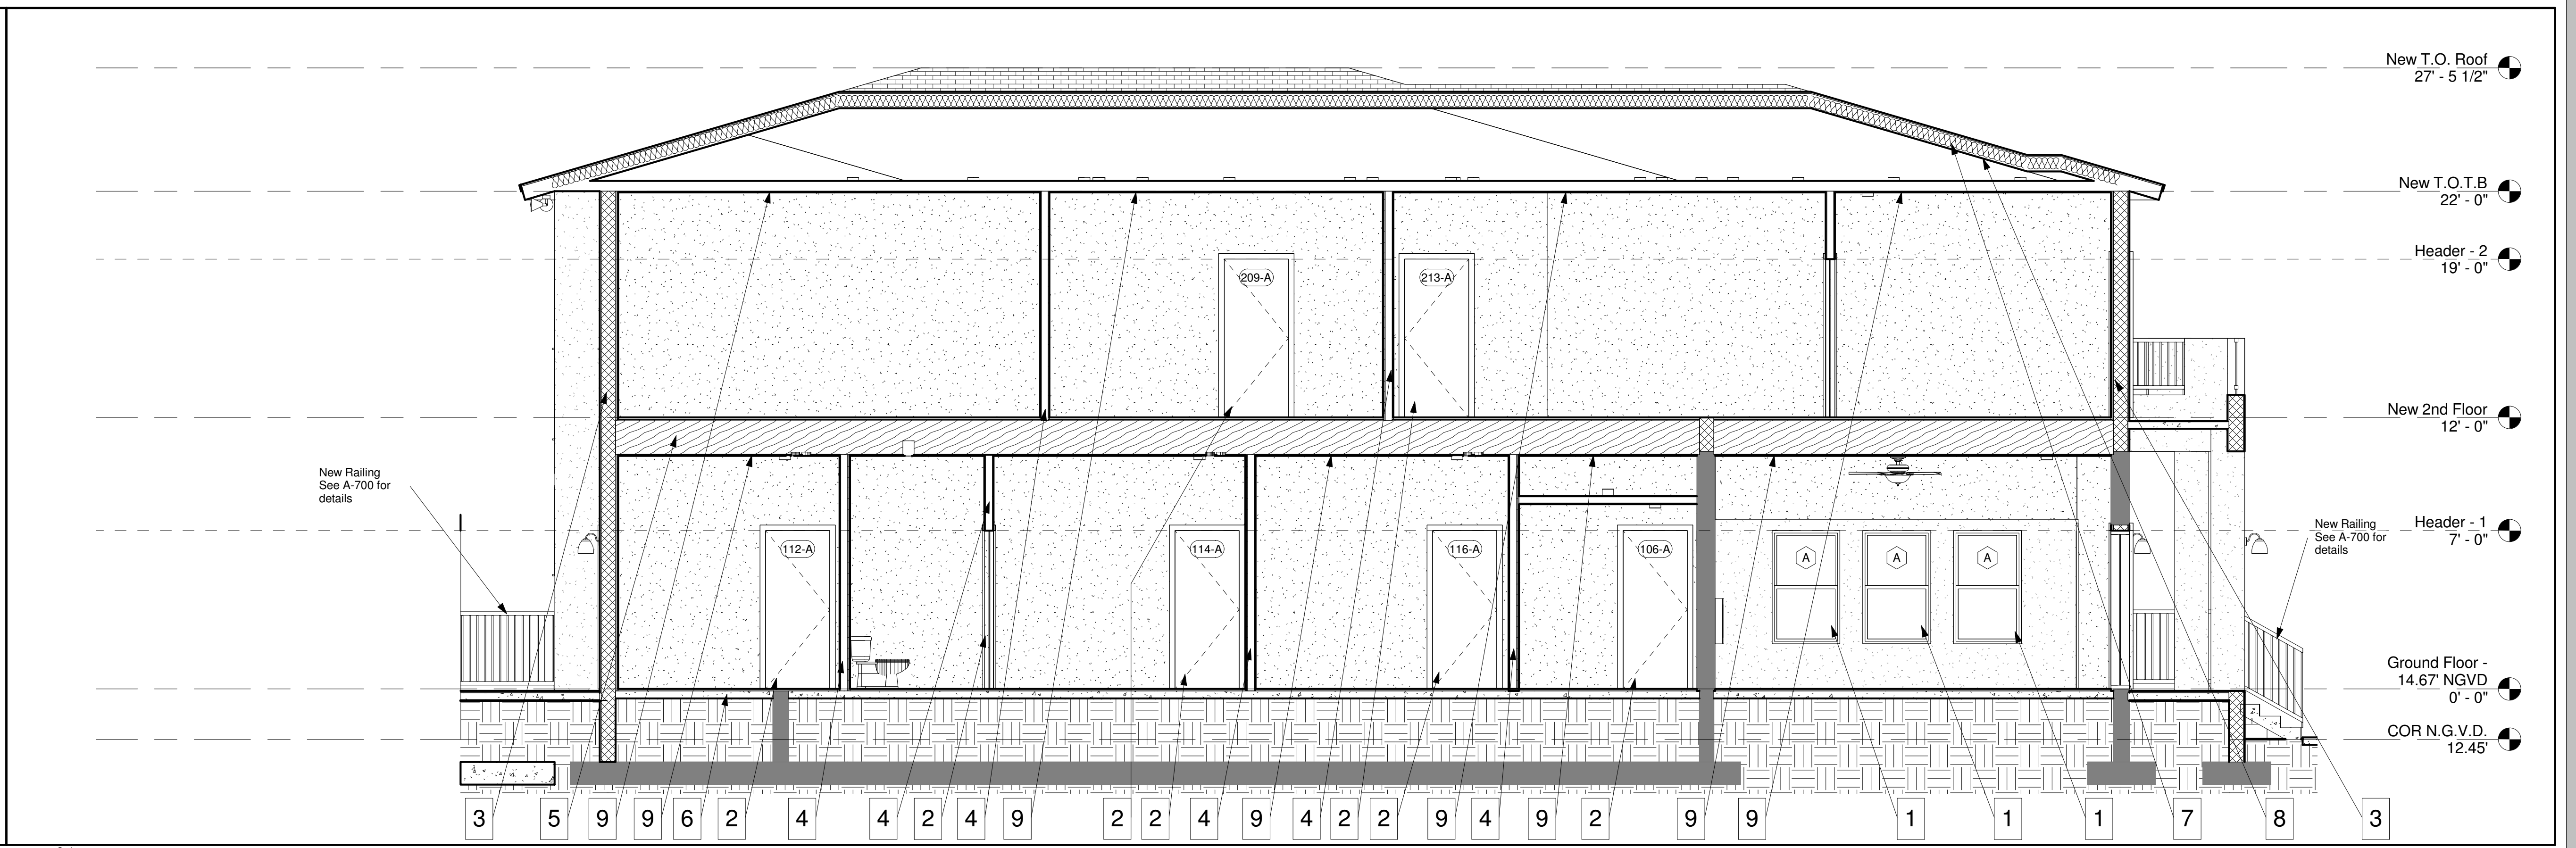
Scale: 1/4" = 1'-0" Section Schedule
